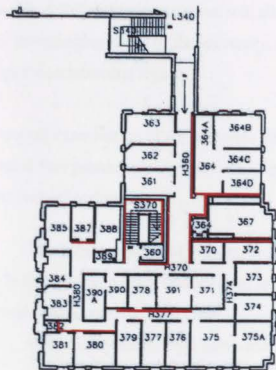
THIRD FLOOR COMMERCE HALL.
